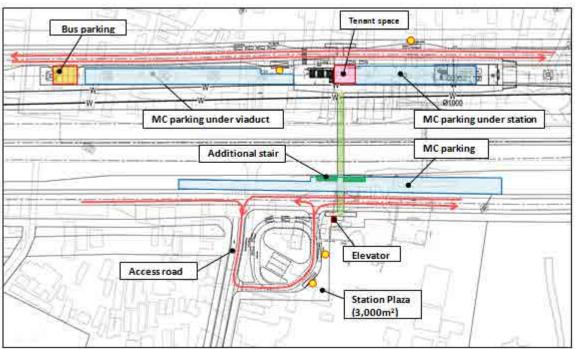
Concept Plan of the Suoi Tien Station Area (Phase II)
